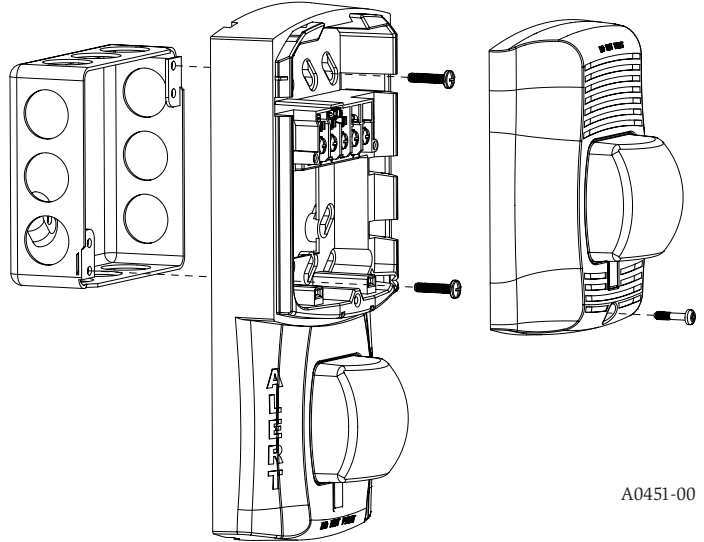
SEP-SPSW (-P) SPEAKER STROBE EXPANDER PLATE FOR FLUSH MOUNT APPLICATIONS:
